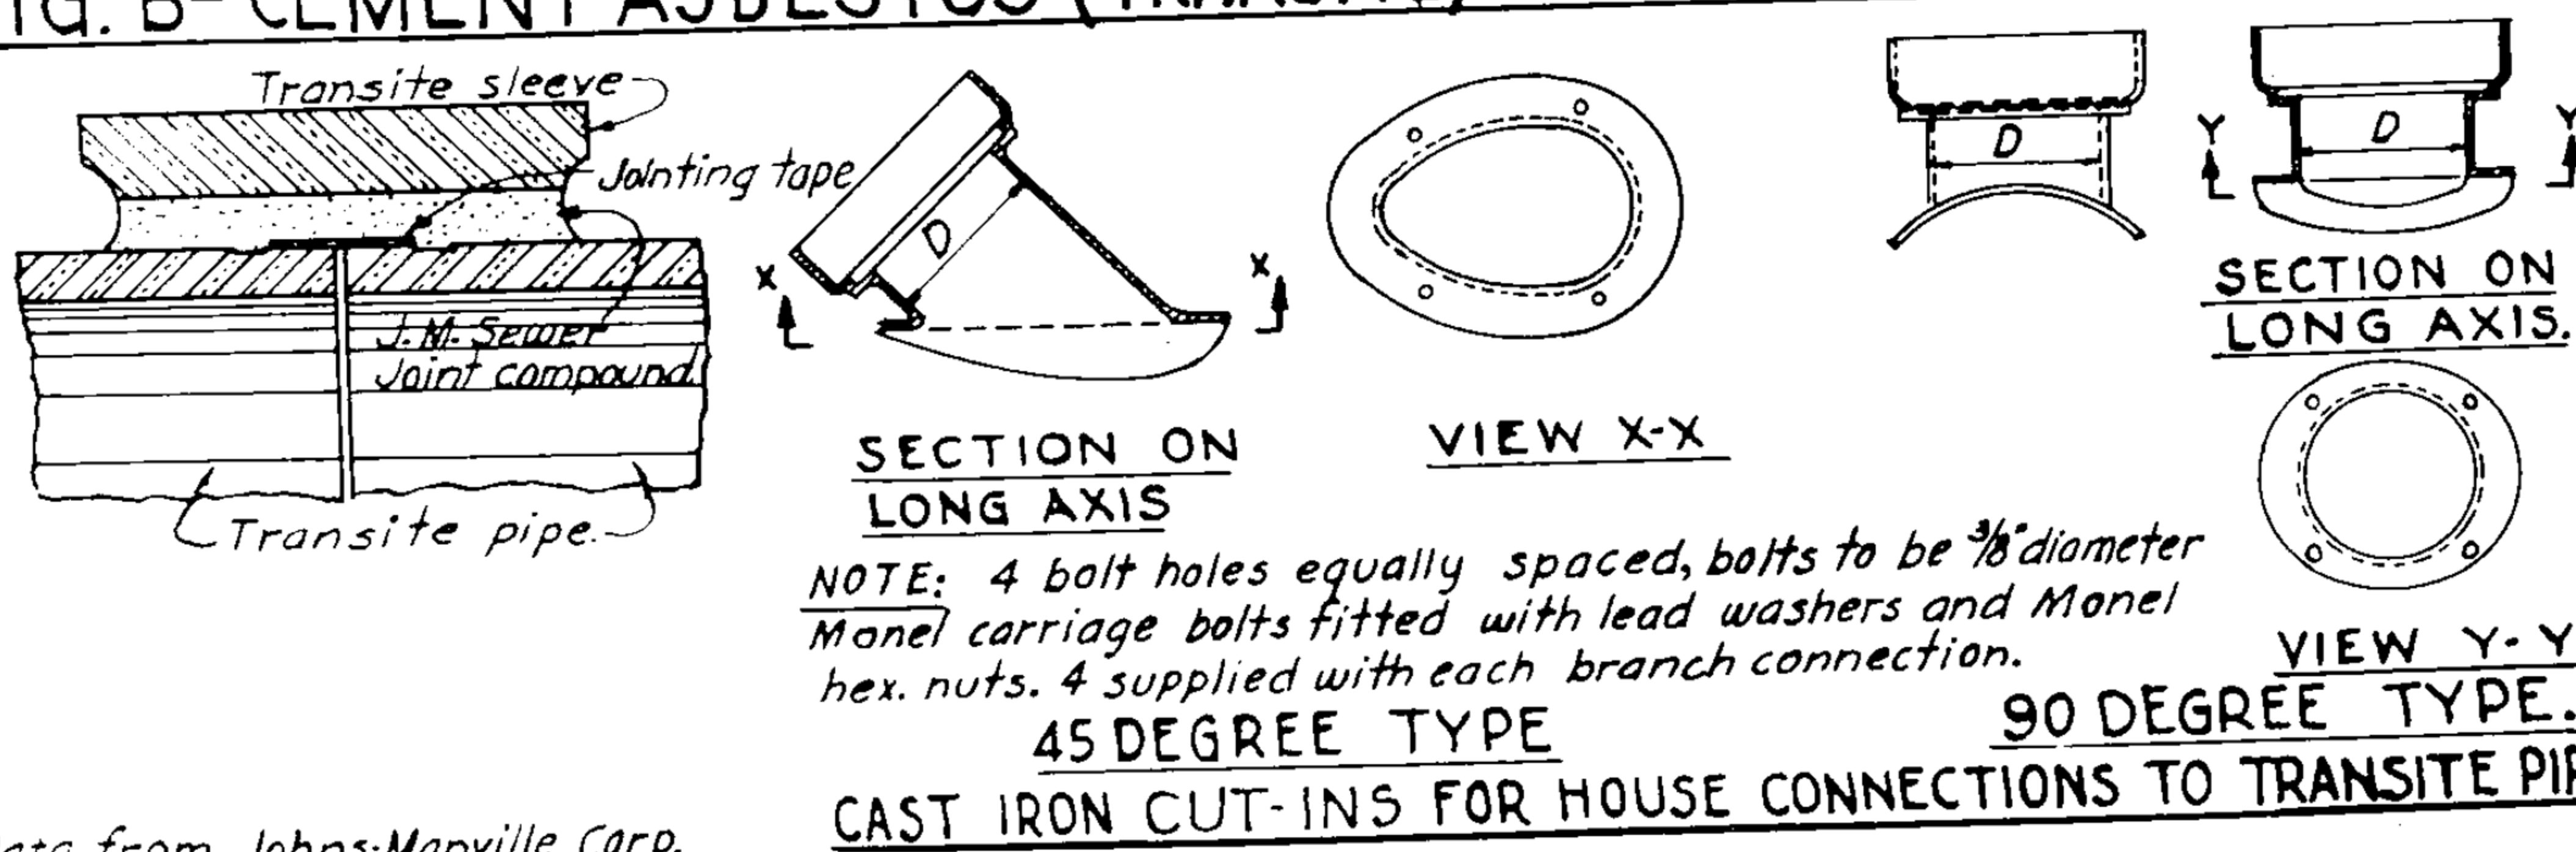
FIG. B - CEMENT-ASBESTOS (TRANSITE) SEWER PIPE DETAILS
